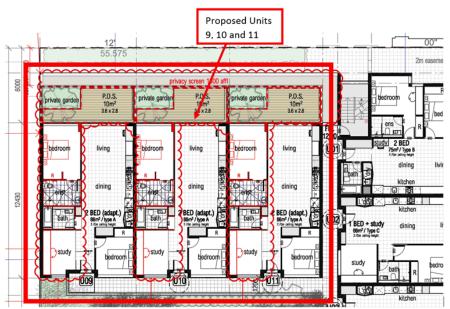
Proposed Units 9, 10 and 11 on Level 2
